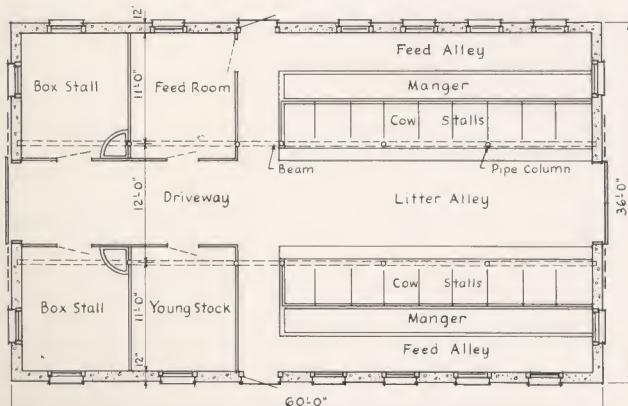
Floor plan of 36-ft. wide dairy barn.
